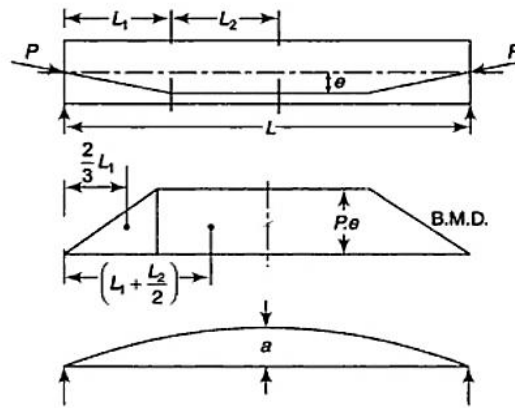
Camber of girder beam under eccentric trapezoidal tendon
